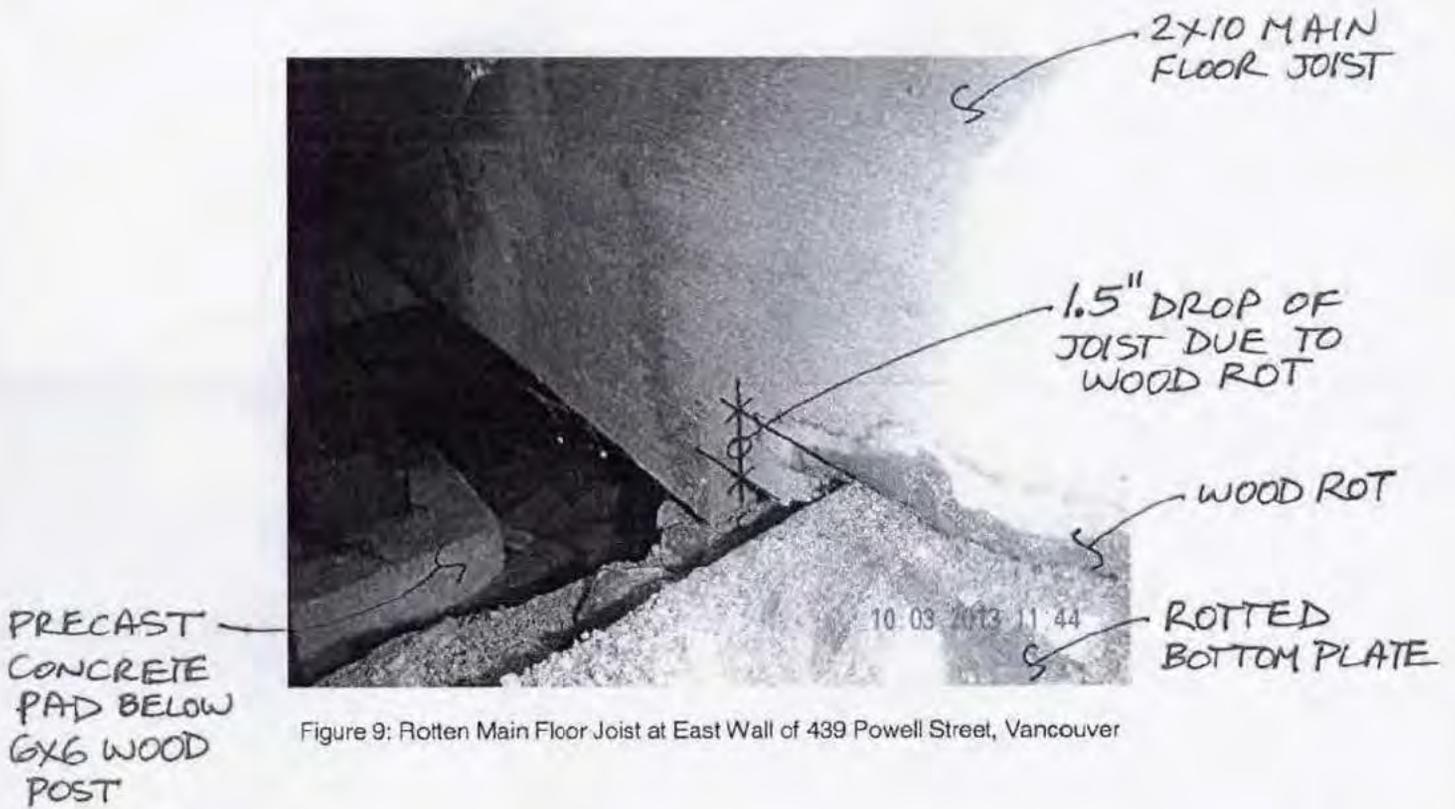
Rotten Main Floor Joist at East Wall of 439 Powell Street, Vancouver
